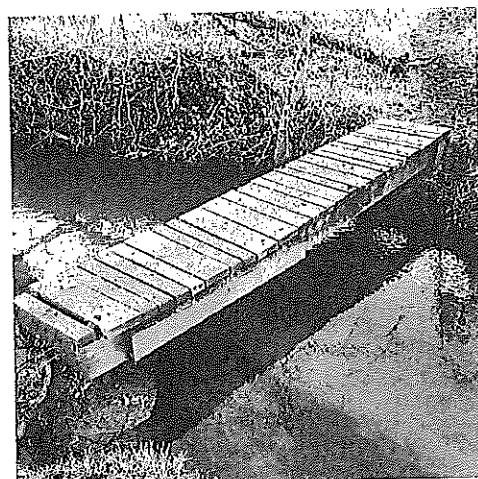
Footbridge at entrance F. Note repair to beam, lack of handrails, bank erosion and steps at each end
